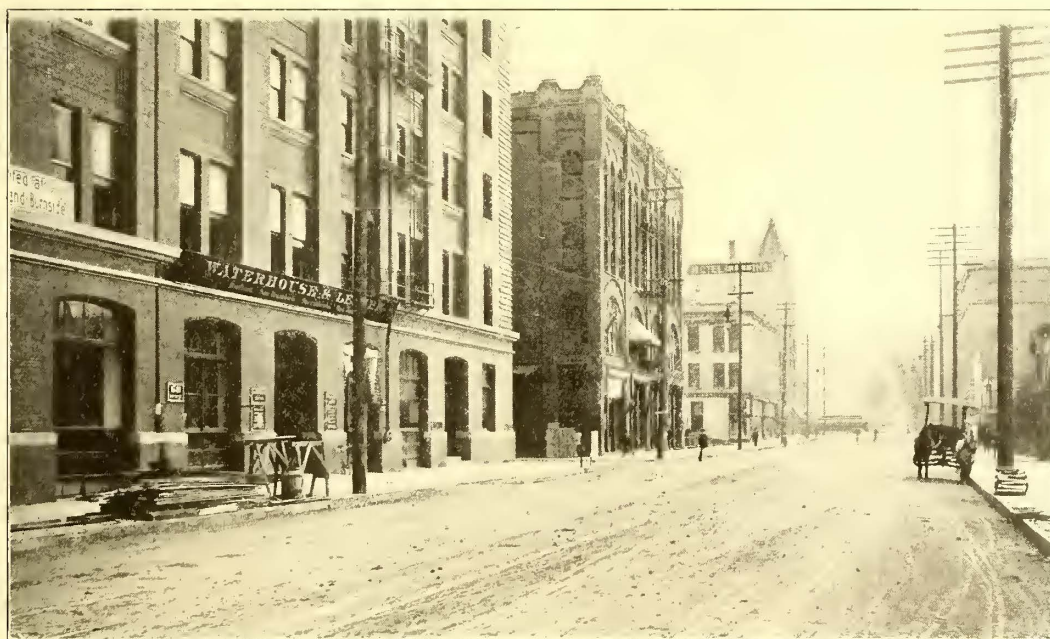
COMPLETED PORTION OF NEW TRACK ON NORTH FIFTH STREET JUST AFTER STREET WORK WAS COMPLETED
